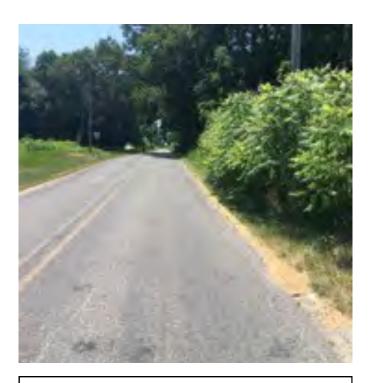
Facing south — view of CR 27 south of U.S. 20.
